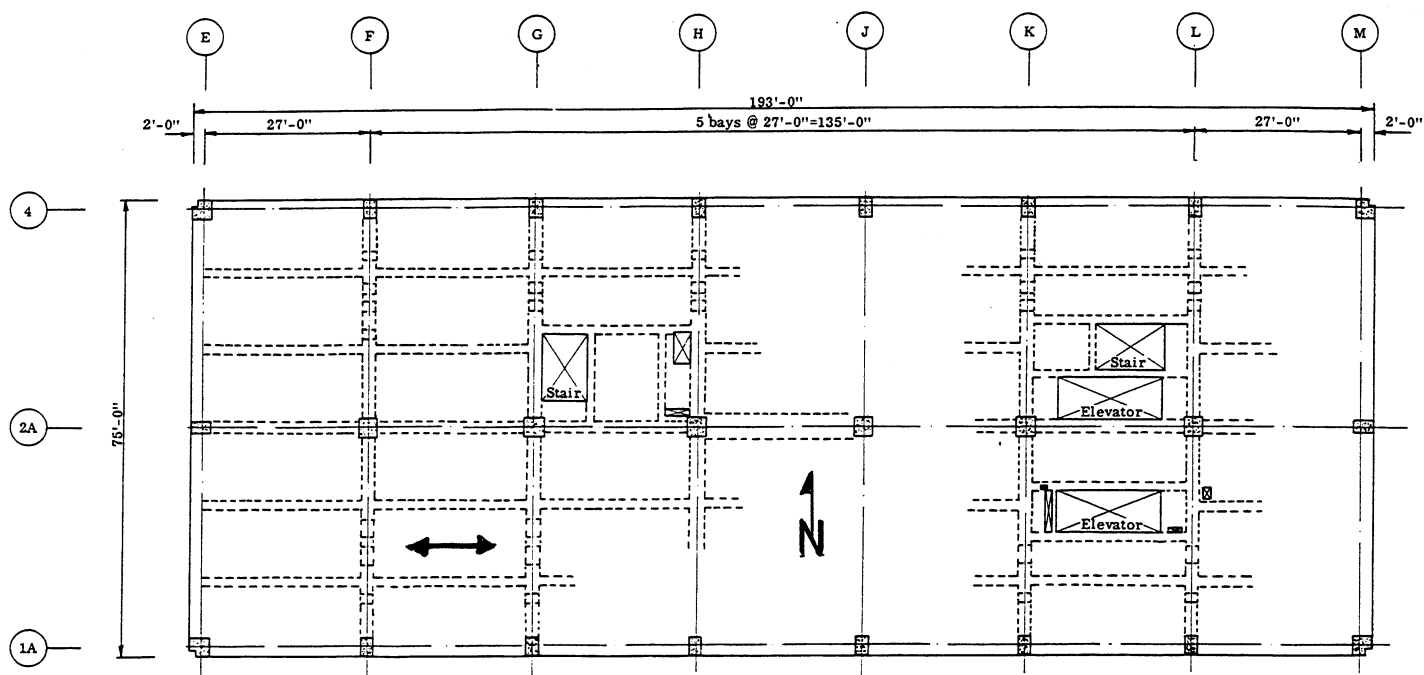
(b) Typical floor-framing plan (After Blume, 1973).
